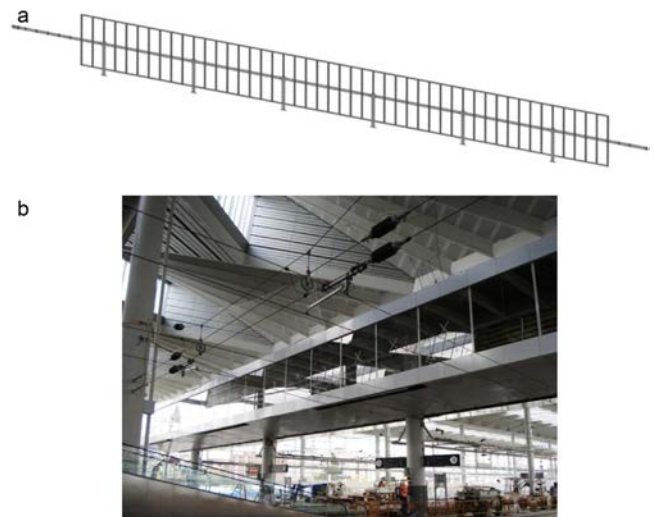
(a) Méndez Álvaro footbridge, plan view. (b) Méndez Álvaro footbridge, photograph taken during construction.
